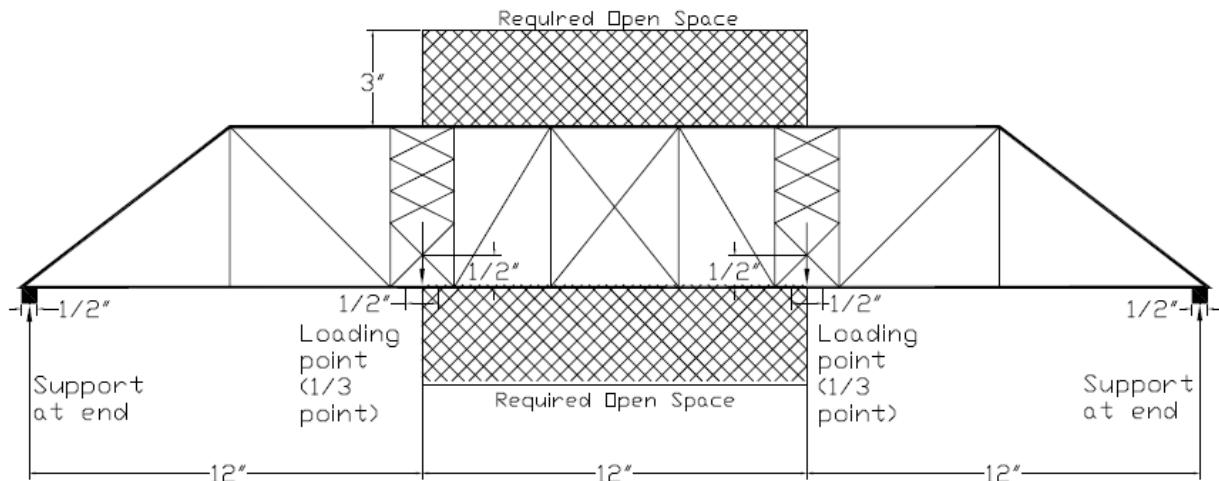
Diagram of support locations and approximate size, loading positions, space between loading points, and 3 inches above and 3 inches below the bridge that must be an open area.
